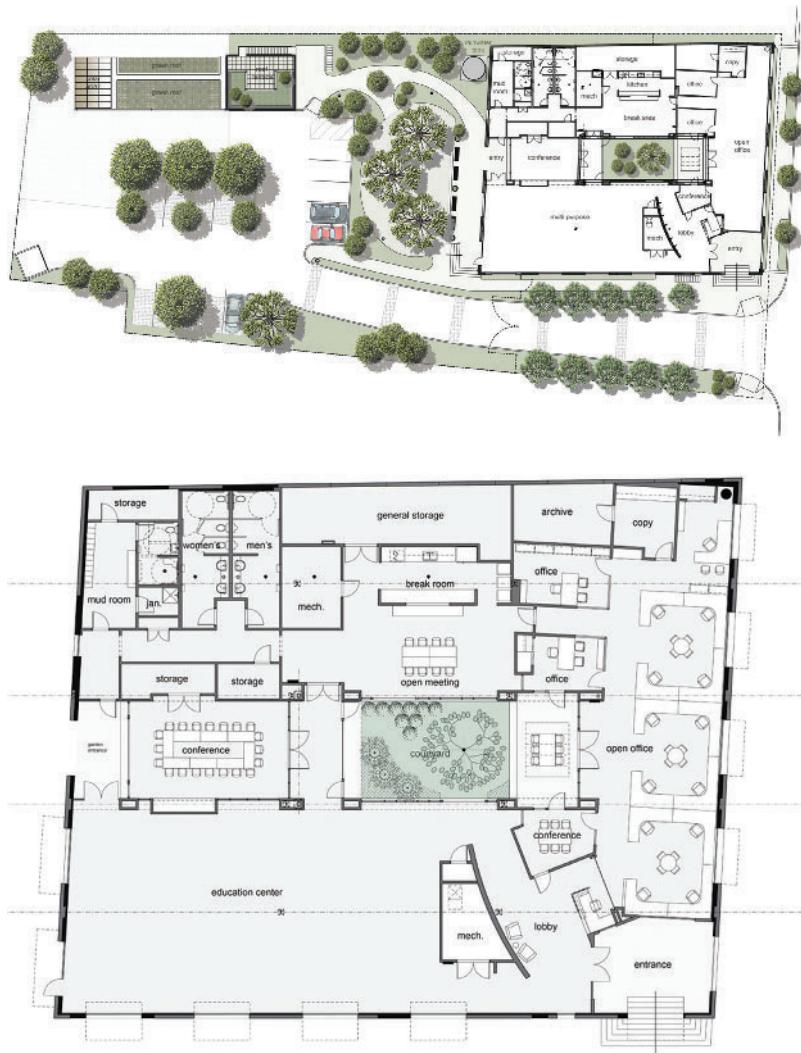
Site plan and floor plan of the Trees Atlanta building
